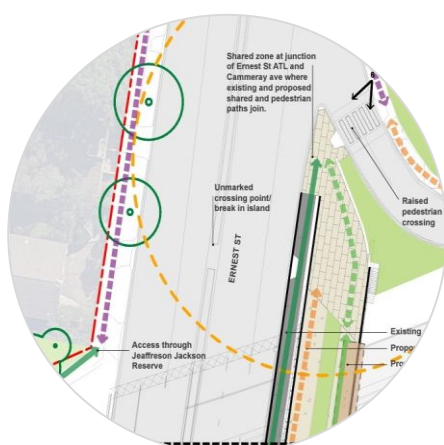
Extract from a plan in Chapter 5 of the PDLP showing connections on the east side of the Ernest Street active transport bridge. It is not possible to cross Ernest St at the desire line that connects St Leonards Park to Anzac Park via Jeaffreson Jackson Reserve (Source: TfNSW/CPBD)
